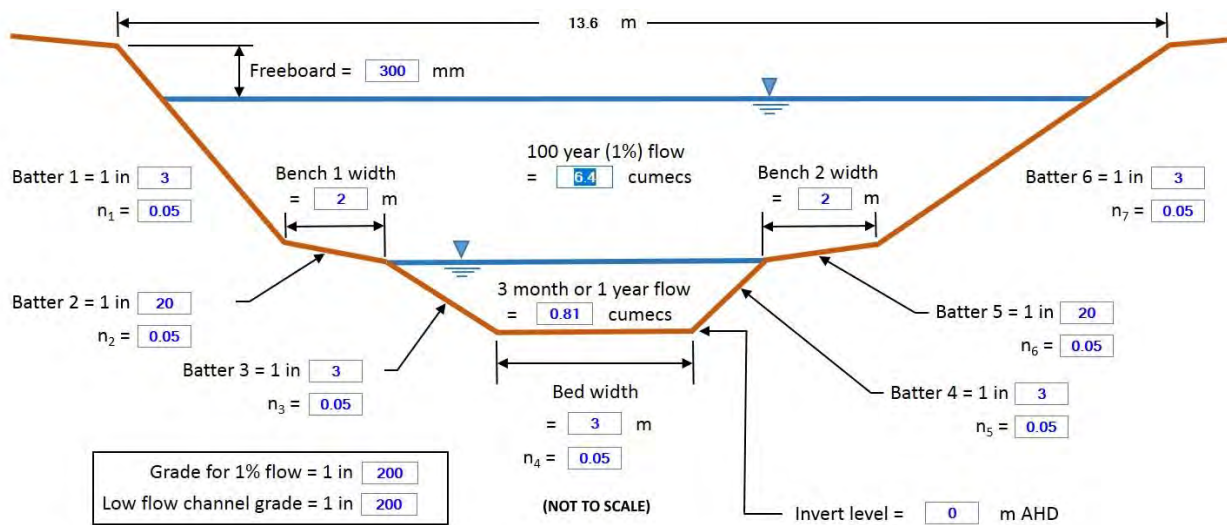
COMPOUND WATERWAY CROSS-SECTION (PC-CONVEY)
